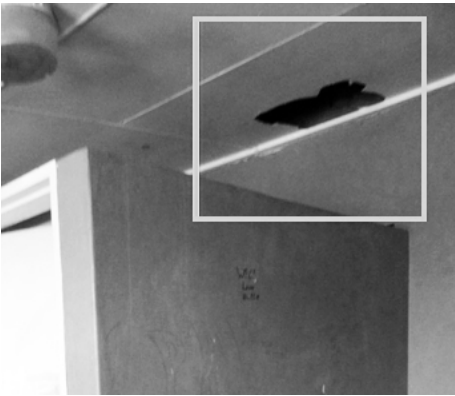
Siyazingisa Primary School, Gugulethu: photograph to show break-in through roof and ceiling
